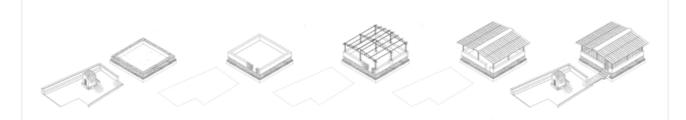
Development of the building, Baban Seth quarry classroom, Navi Mumbai [Source: Bo Tang]
